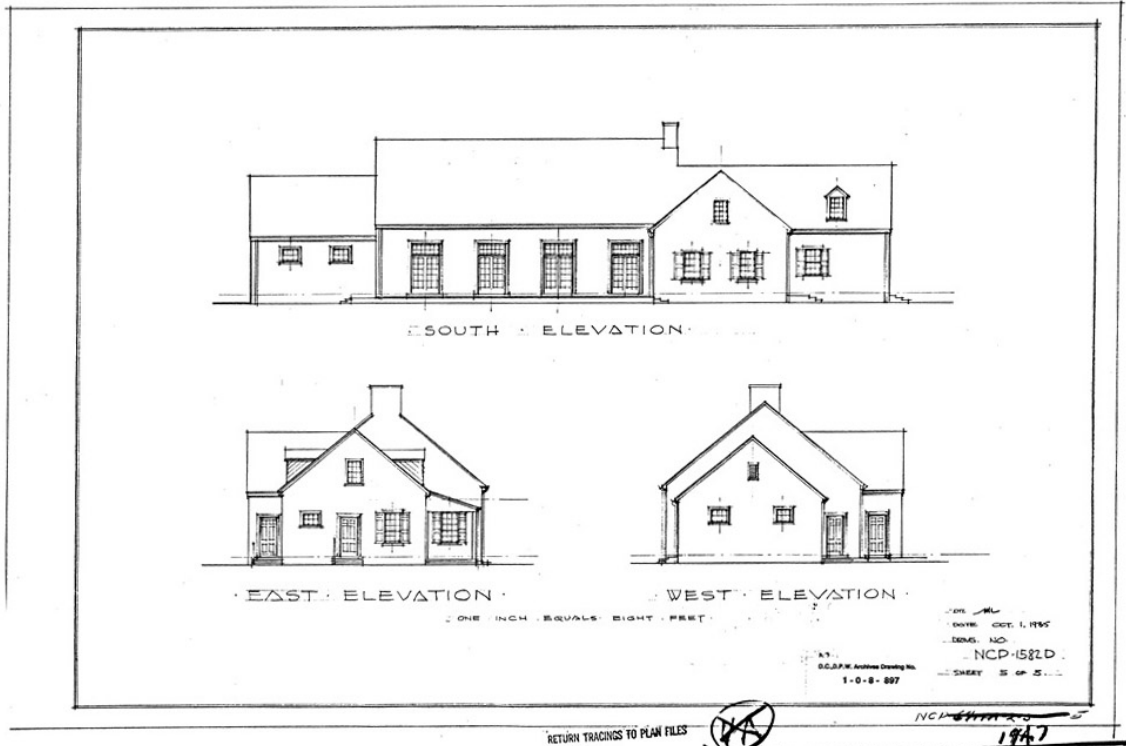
South, east, and west elevation drawing prepared by the Branch of Plans and Designs in 1935 (Department of General Services).
